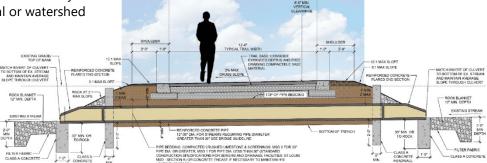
Example Cross Section (Source: Great Rivers Greenway)
